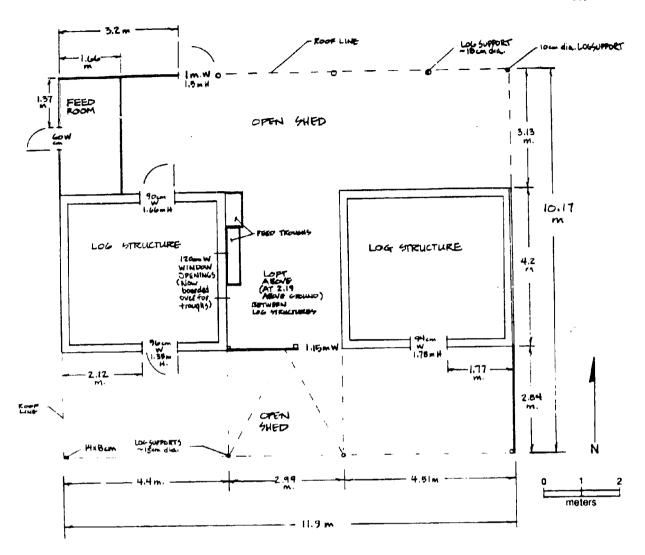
Field architectural floorplan of double-pen outbuilding at 41CO120.
